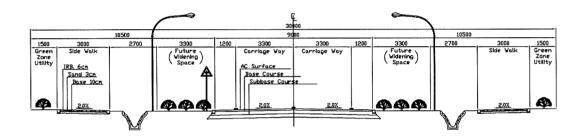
Typical Cross Section for Radial Road Segment-1 (for ML7)
